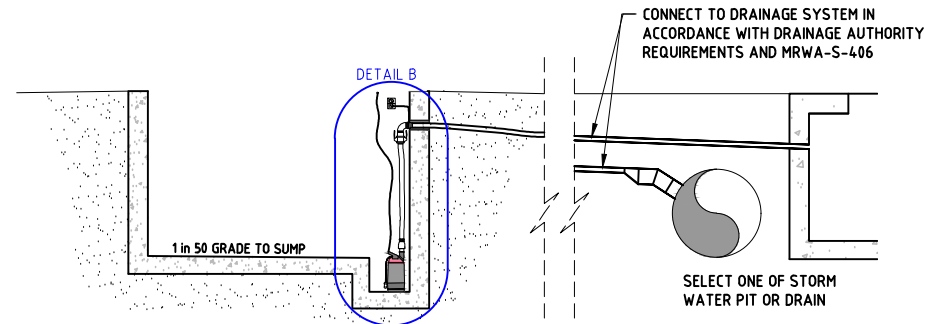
D: SUMP PUMP TO STORM WATER PIT (PREFERRED) OR STORM WATER DRAIN MAY BE NECESSARY WHEN DRAINAGE SYSTEM IS HIGHER THAN PIT FLOOR
